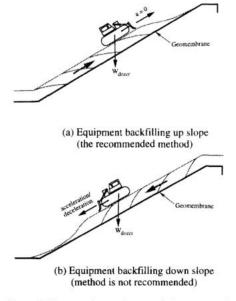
Construction equipment placing cover soil on slopes containing geosynthetics.
